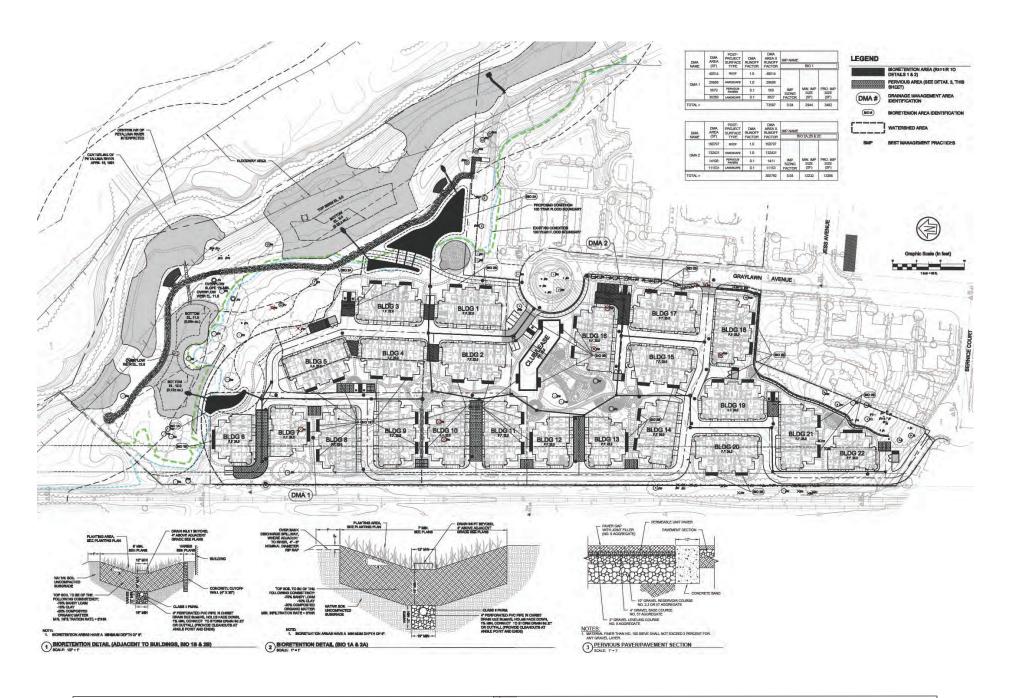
Revised Project's Preliminary Storm Water Control Plan
